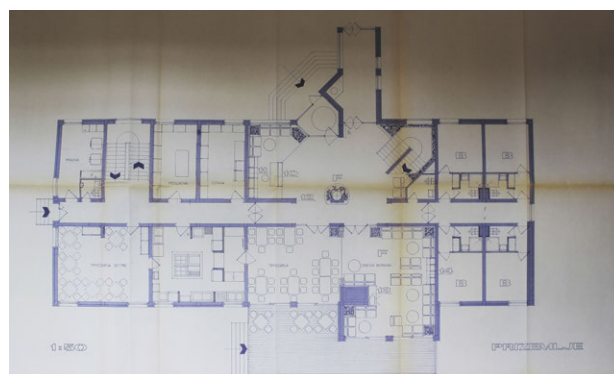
The Convent of the Assumption of Mary: ground floor plan of the third convent; segment of the project “Stambena zgrada u Tolisi, projekat enterijerskog uređenja” (Residential building in Tolisa, project of interior design) done by architect Ivo Boras, dated in August 1987 (Archive Tolisa)
